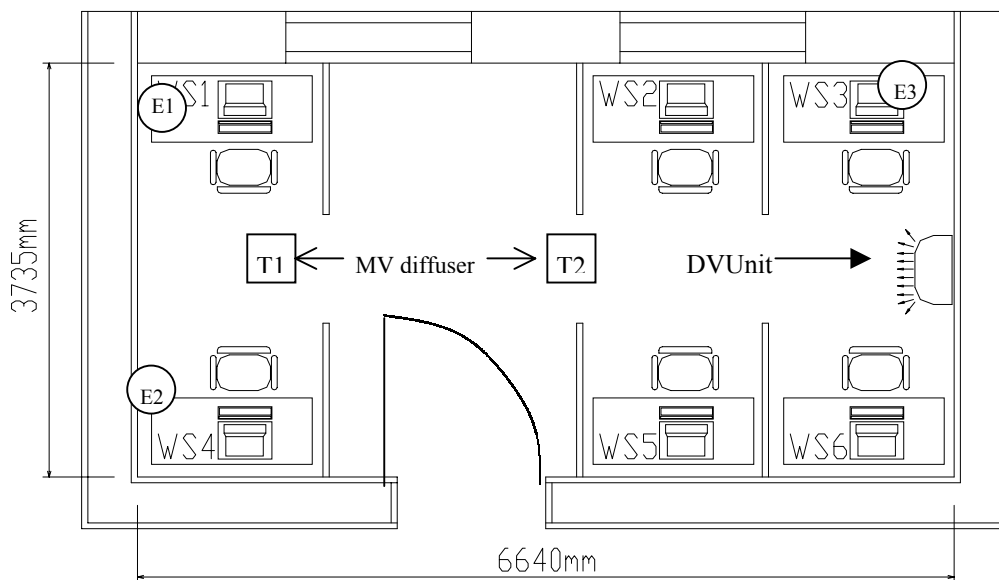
Chamber layout. (Note: WS denotes workstation and E denotes extract grille.)
